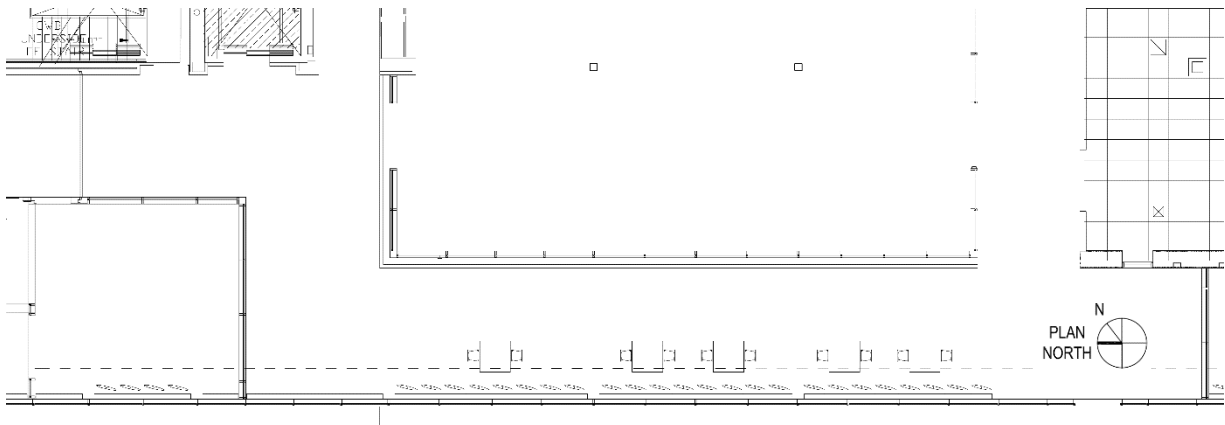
First Floor South Plan - Wellness Lobby and Corridor
